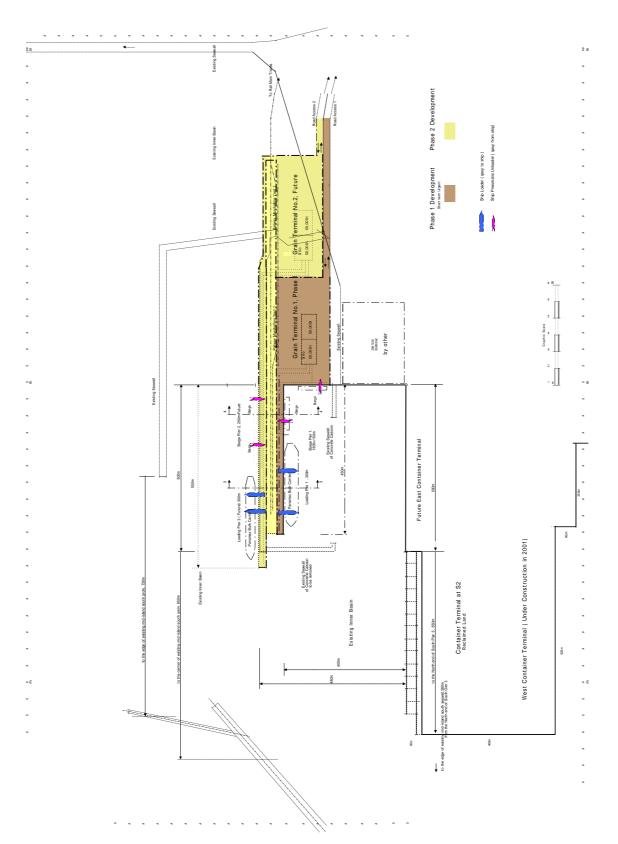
General Plan of Grain Terminal, Alternative B1: South Pier 3
